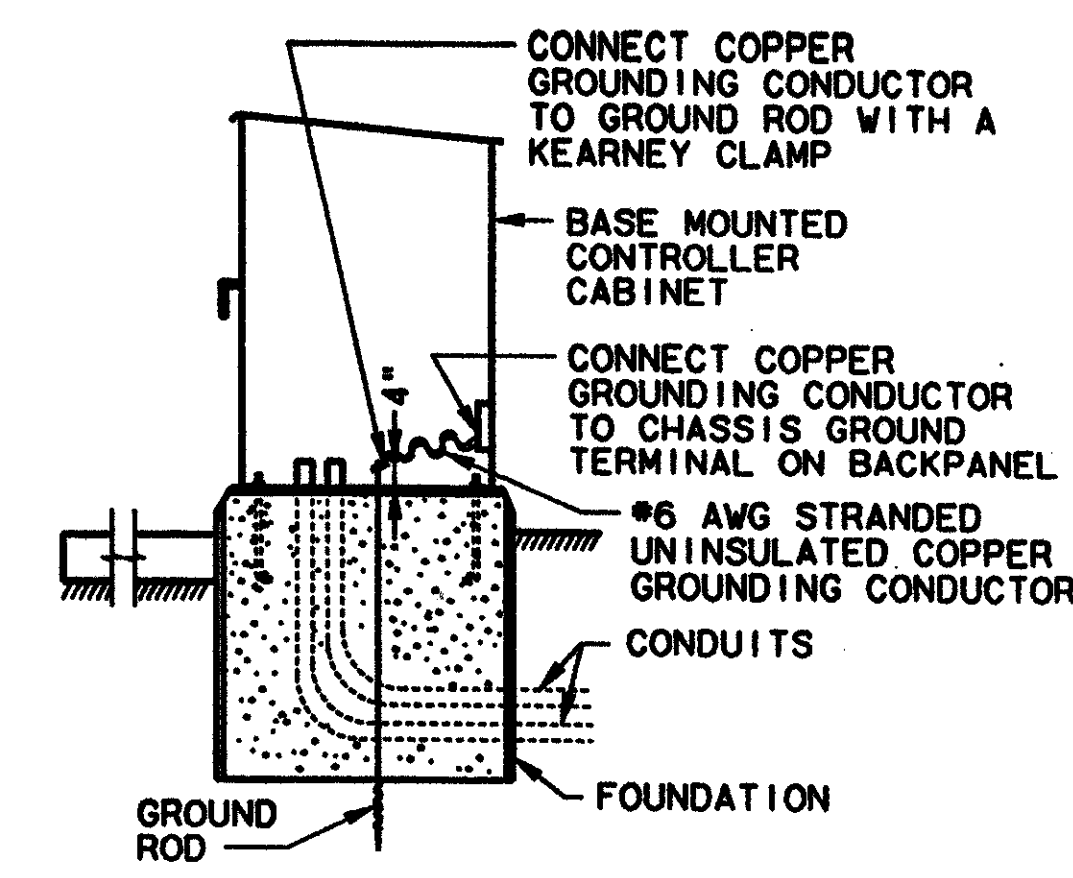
DETAILS FOR INSTALLING CONTROLLER CABINET AND FOUNDATION
